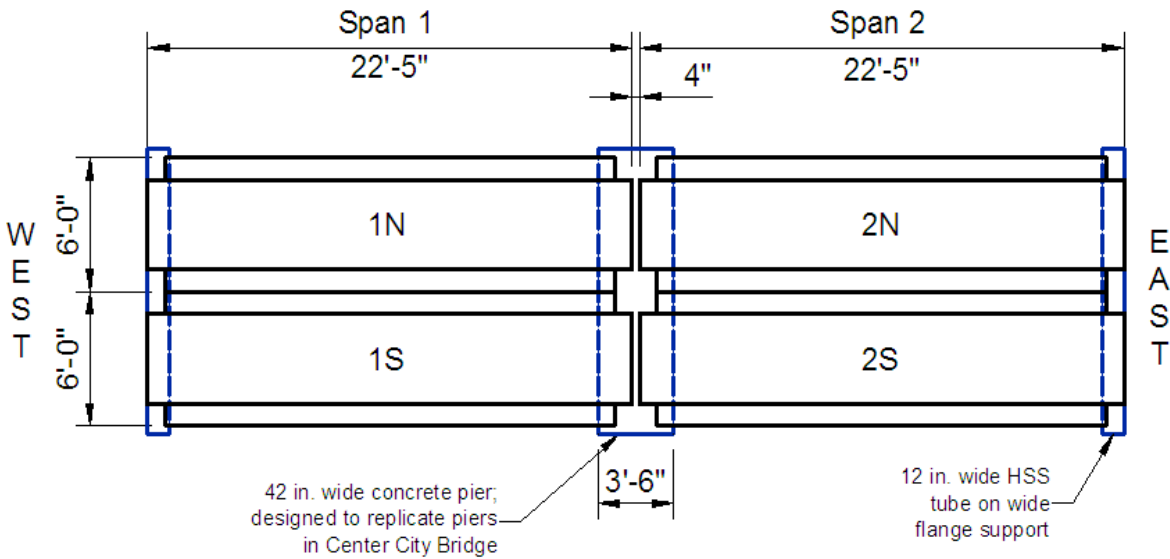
Plan view of the Concept 1 laboratory bridge, including support locations and relevant dimensions. Transverse reinforcement near longitudinal precast joint is not included for clarity
